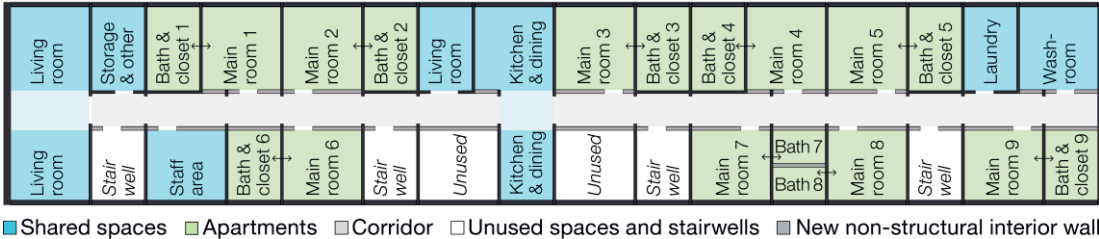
Example floor plan of a full group home adaptation. (Adapted from article I.)
